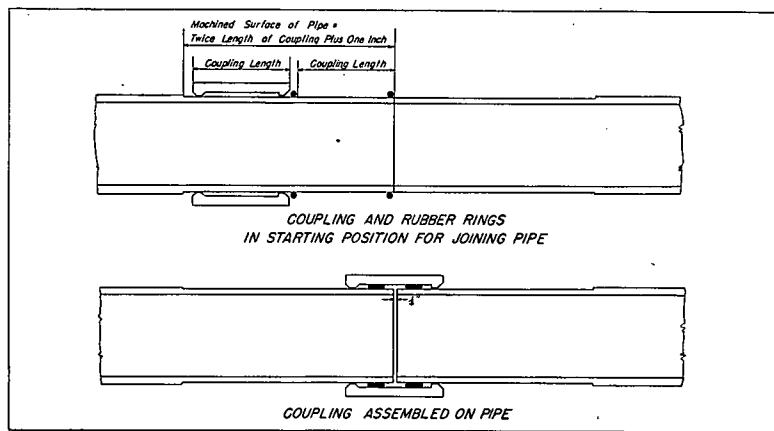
TYPICAL COUPLING FOR ASBESTOS-CEMENT PRESSURE PIPE
